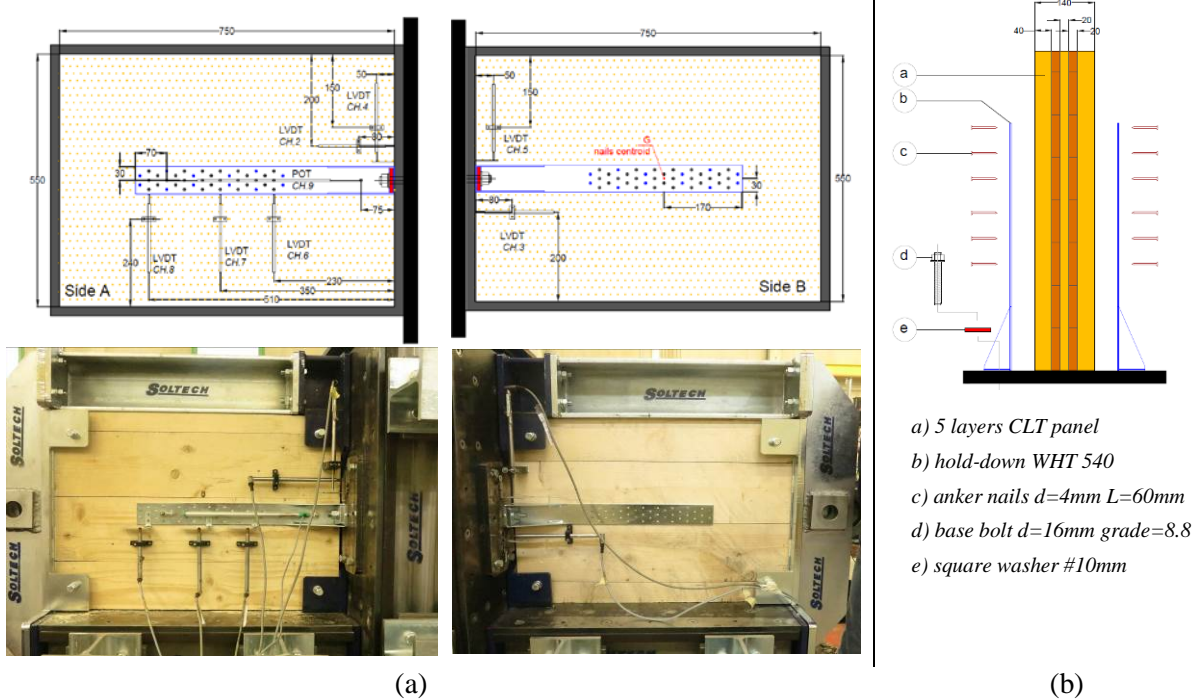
(a) Side views of the test setup and (b) geometry of specimen
